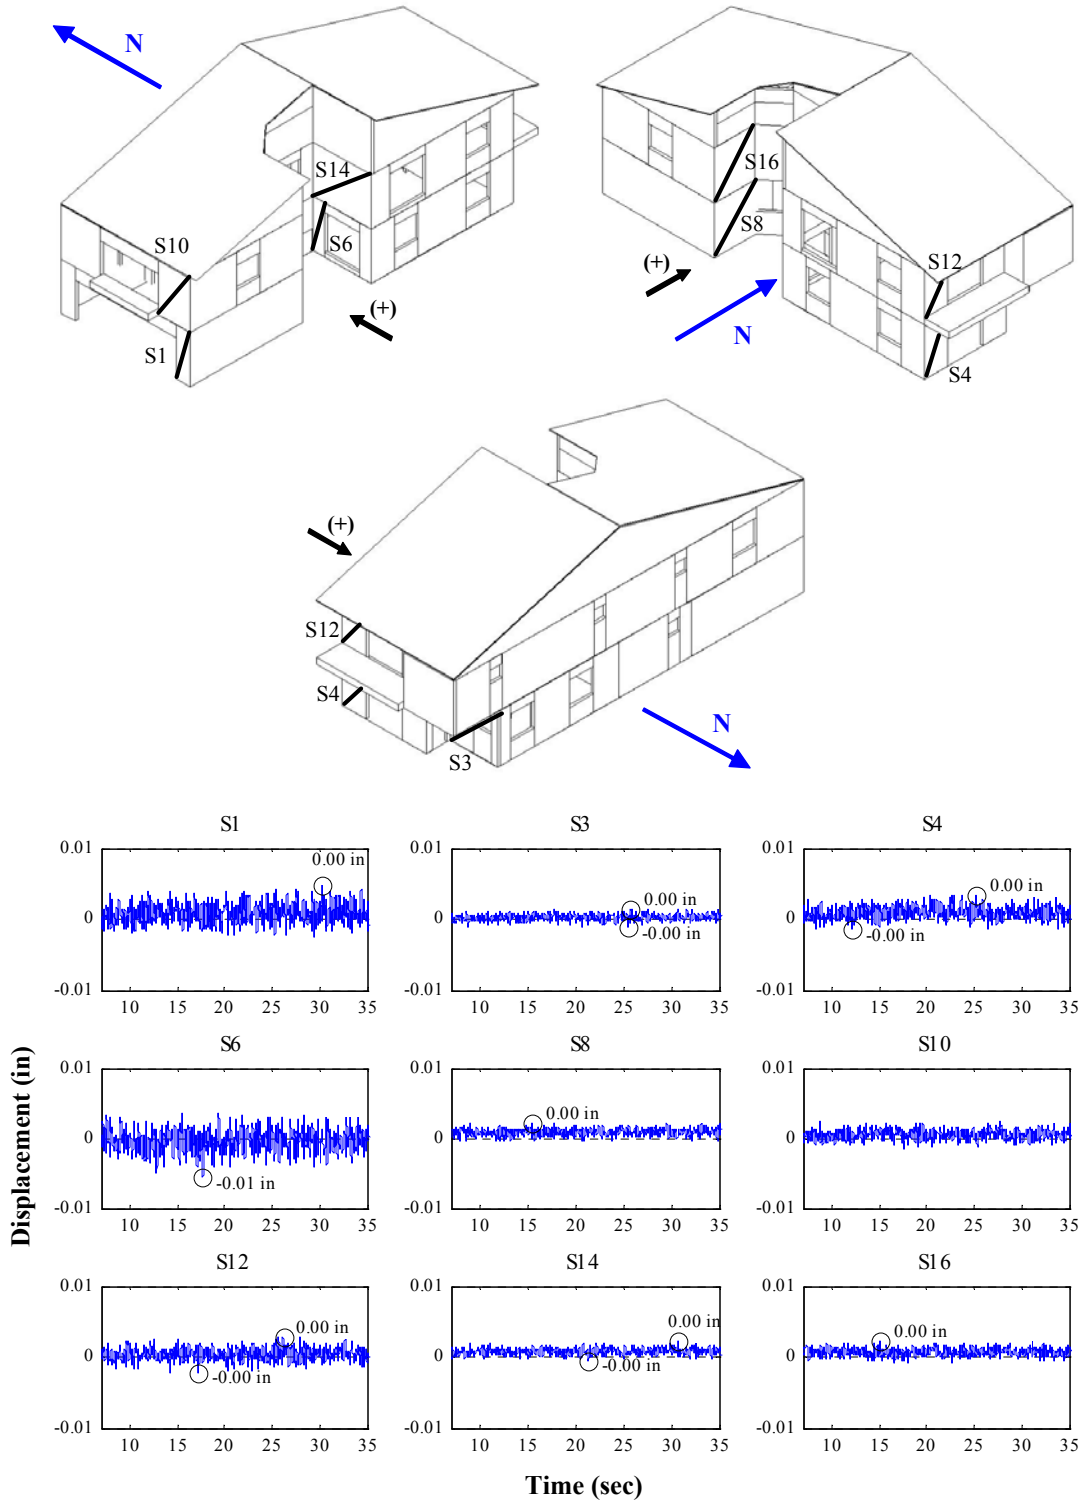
Wall deformations of north-south external walls for Test NWP1S03
